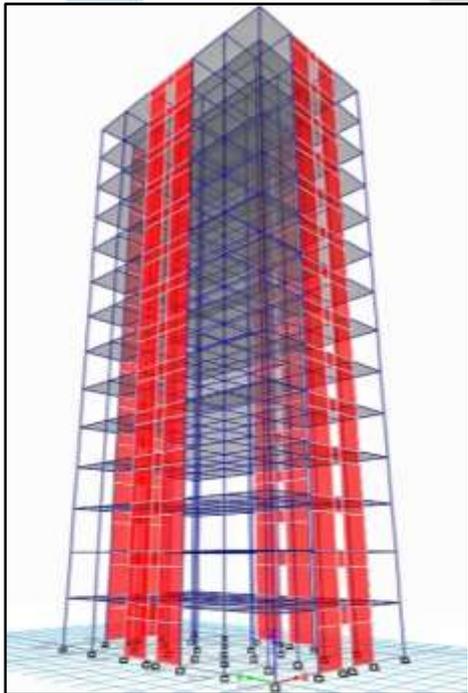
Model II - Shear Wall Structure with Opening of Size (1m X 2.5m)
